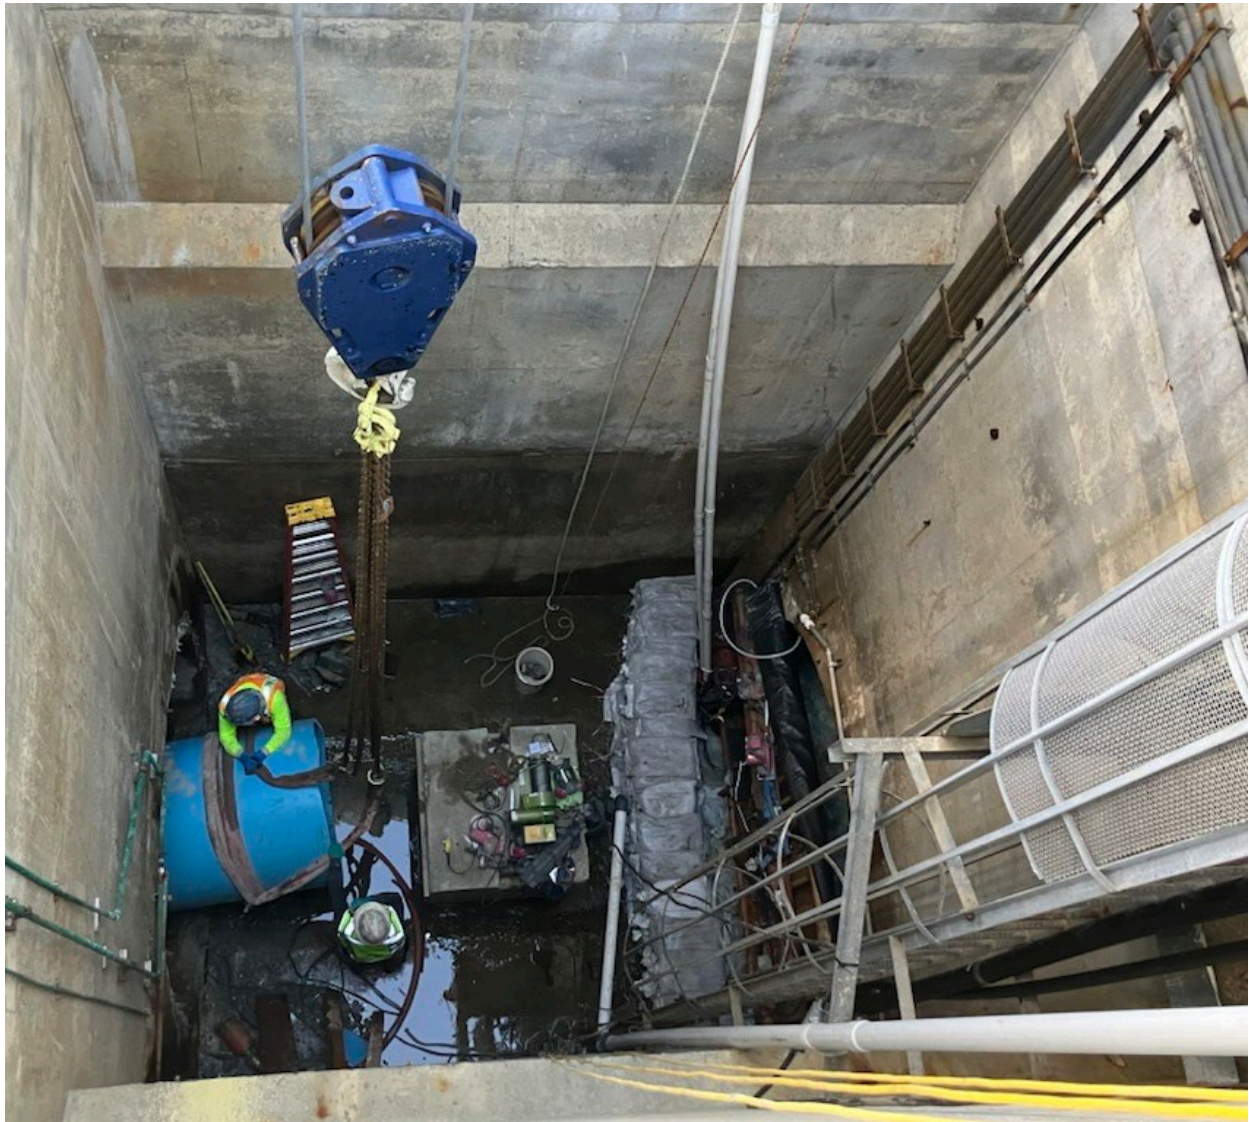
Claremont Tunnel Access Shaft: view looking down as workers install slings around 48-inch Effluent 1 bypass piping in preparation for crane lift of the pipe out of the tunnel.
